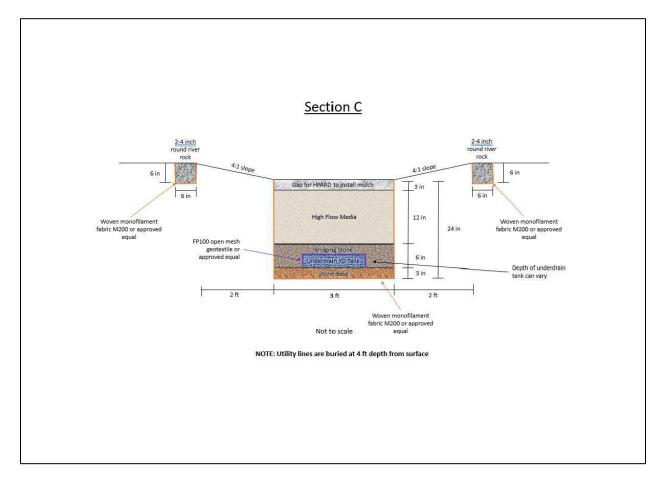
Cross-section design for Section C of the Townwood Park GSI project.
